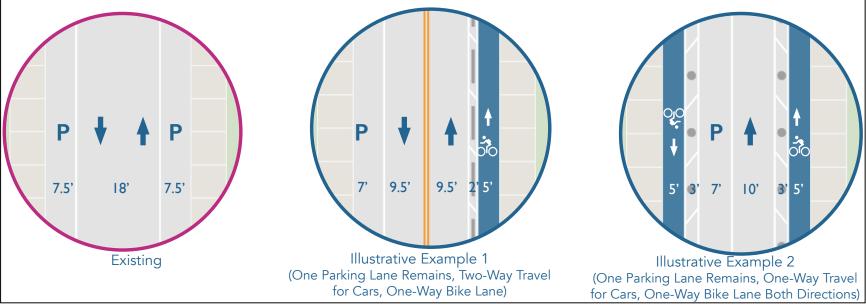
Street Layouts for a Common Somerville Street Width of 33 Feet
